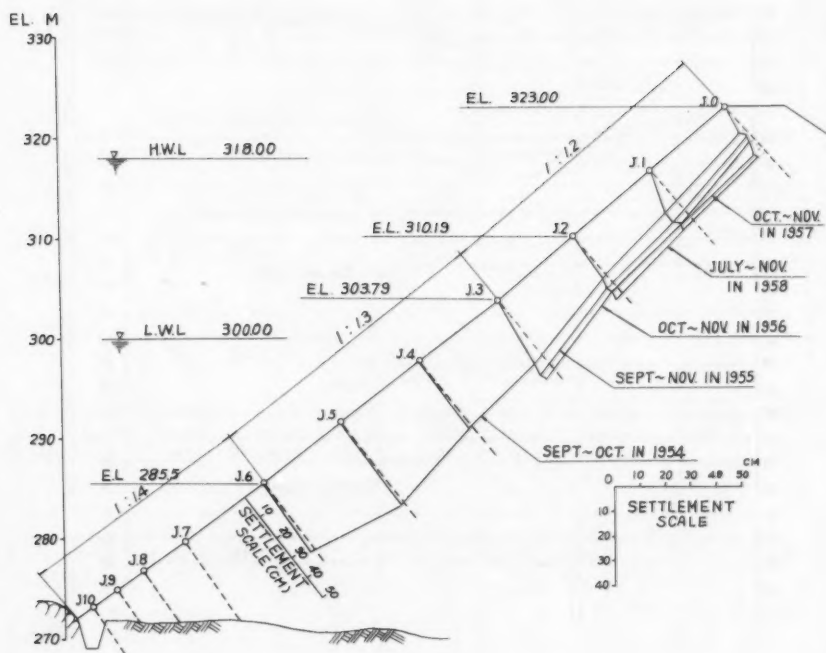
SETTLEMENT AT MAXIMUM SECTION
